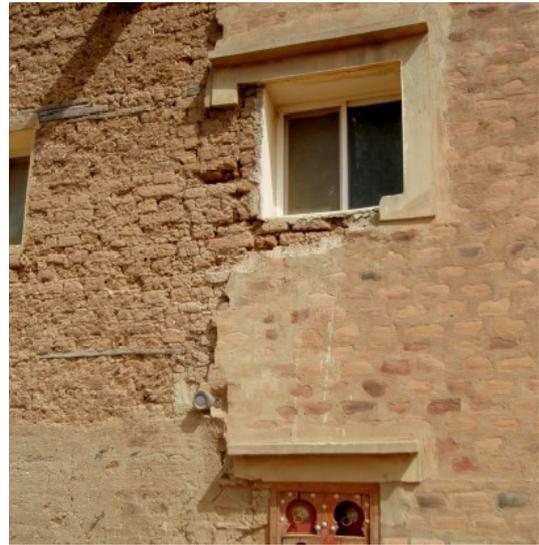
Djenné (Mali), the damages of an earthen masonry, plastered with terracotta bricks
